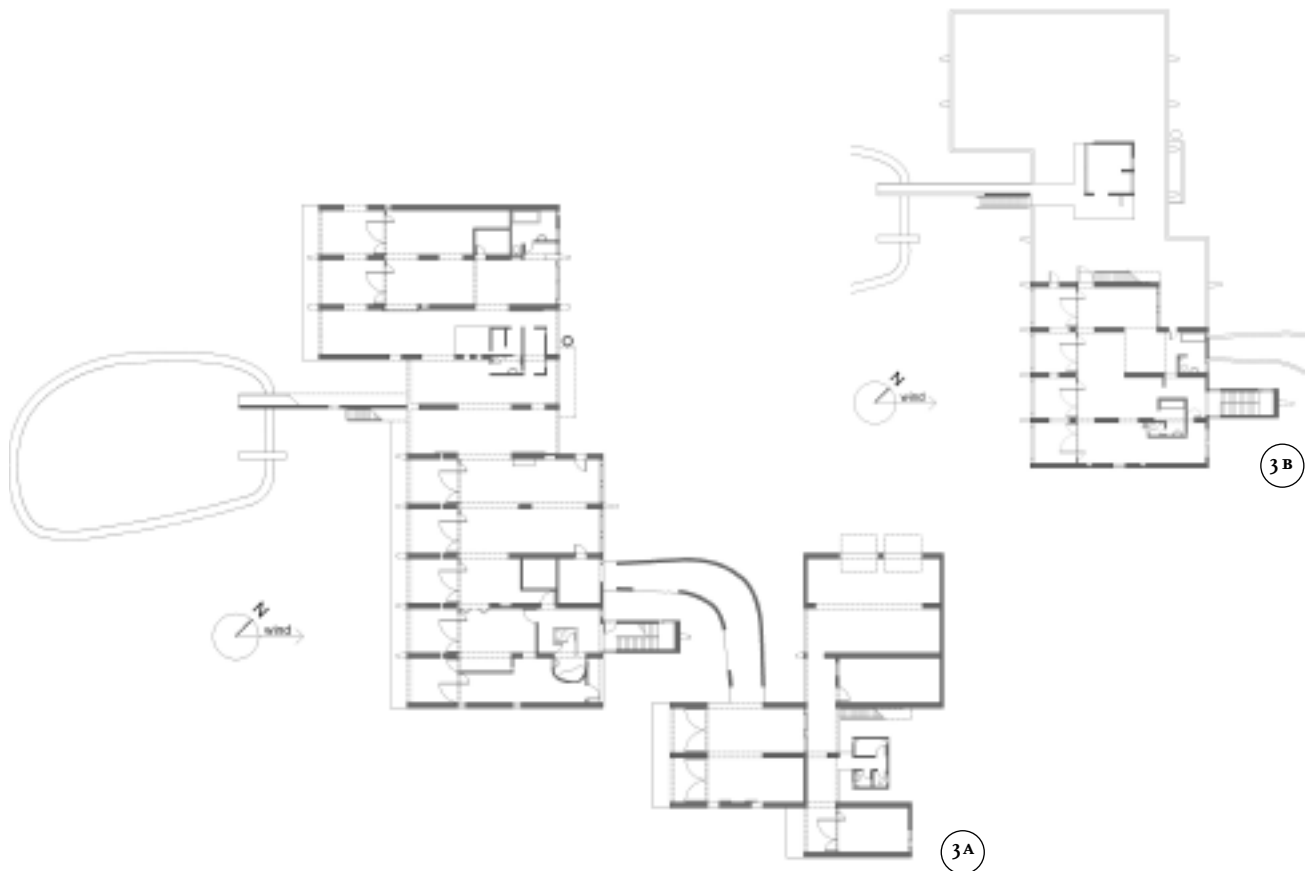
A) Sarabhai house first-floor plan. B) Sarabhai house second-floor plan. Drawn from as-built measurements.
